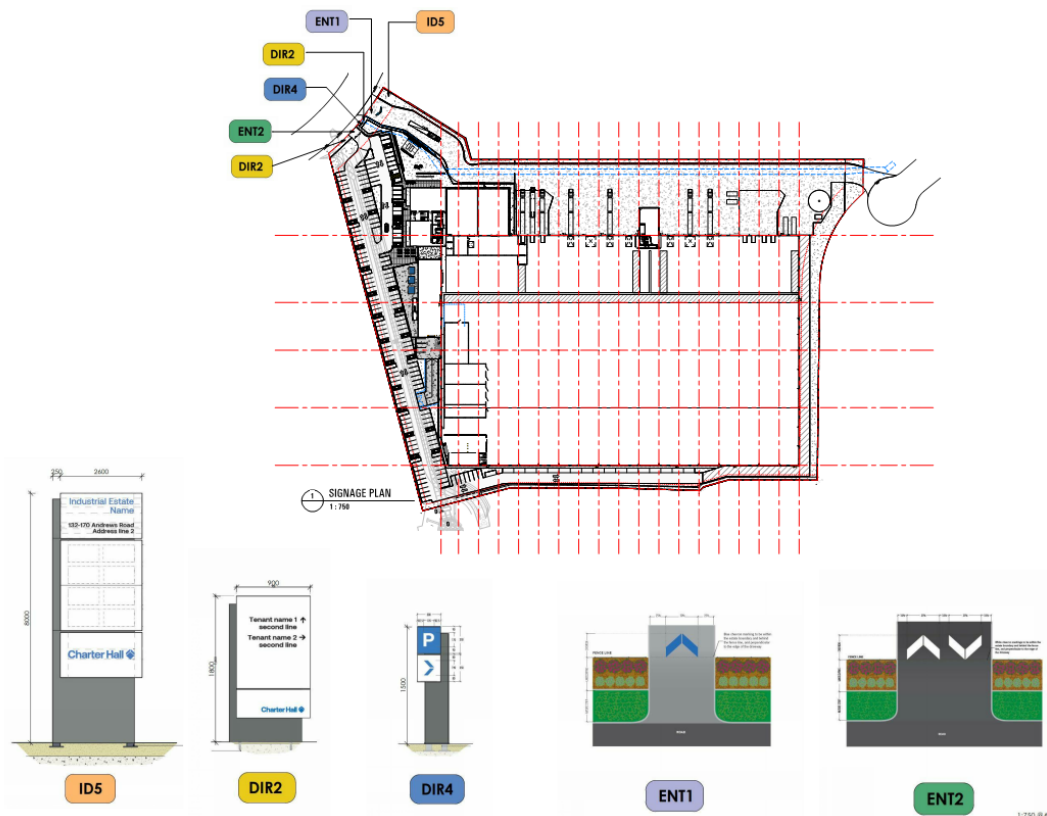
Signage Plan (Source: Qanstruct, 2022)
